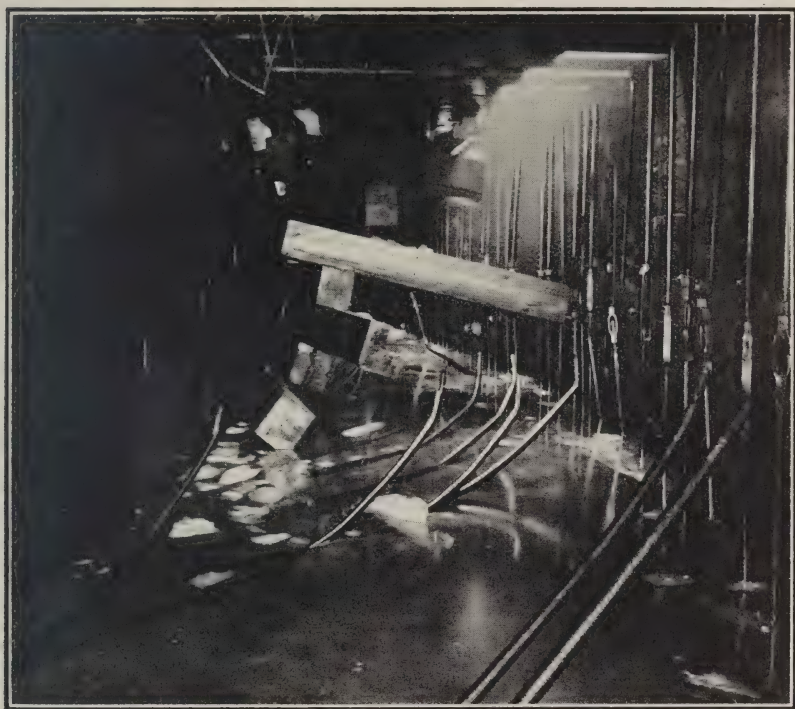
St. Marys Falls Canal, Poe Lock. Damage to north filling culvert, looking east from point under miter wall at 3345 East, showing broken timber of north wall, January 8, 1914.
